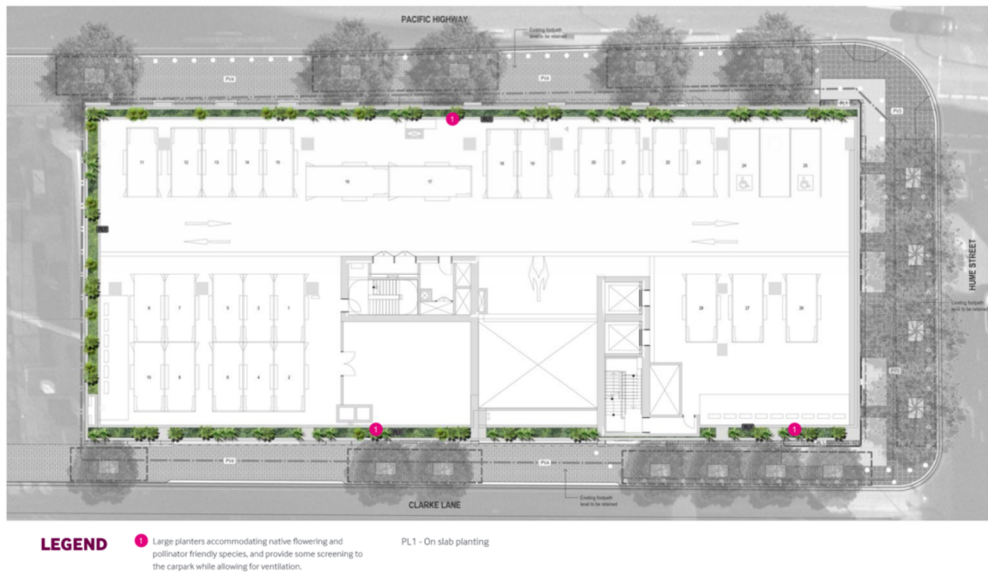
Landscape Design Draft Level 05 Plan (RPS)
